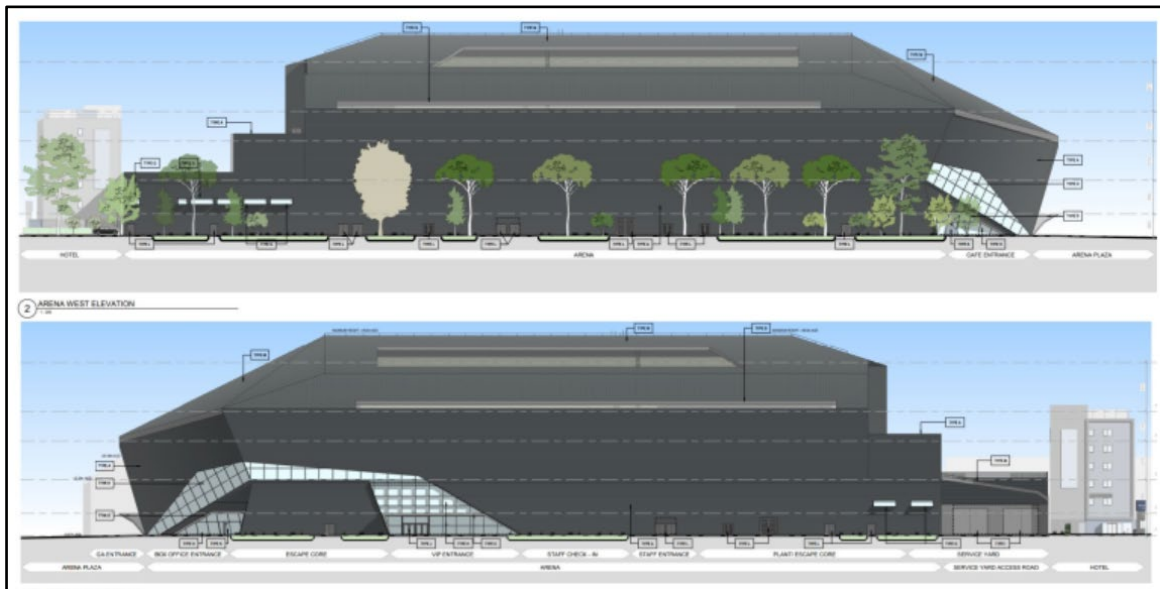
Side Elevations (East and West) of Arena (21/02687/MJR)
